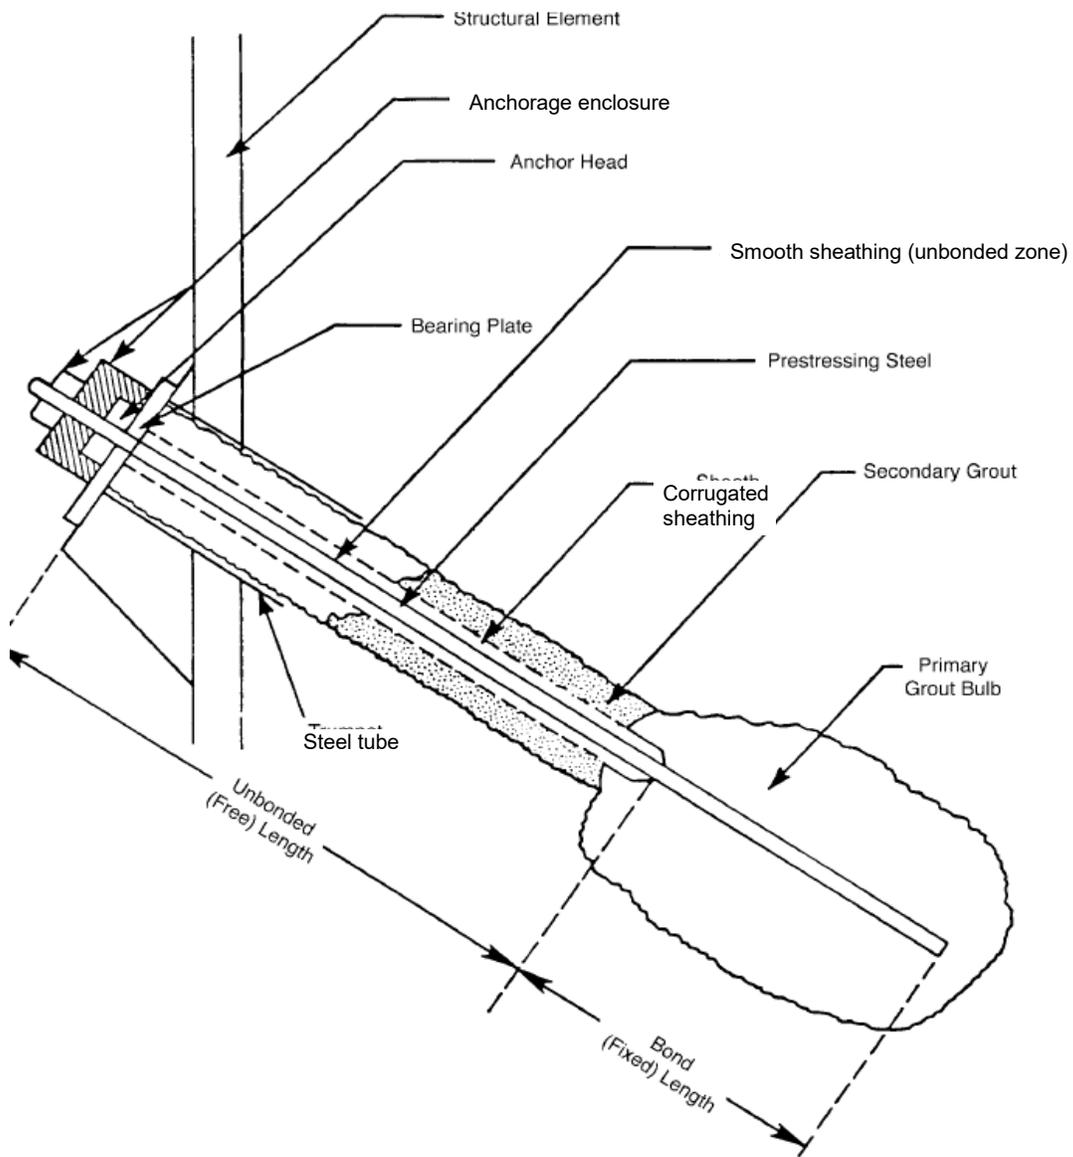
Sub Horizontal Ground Anchor Schematic.
